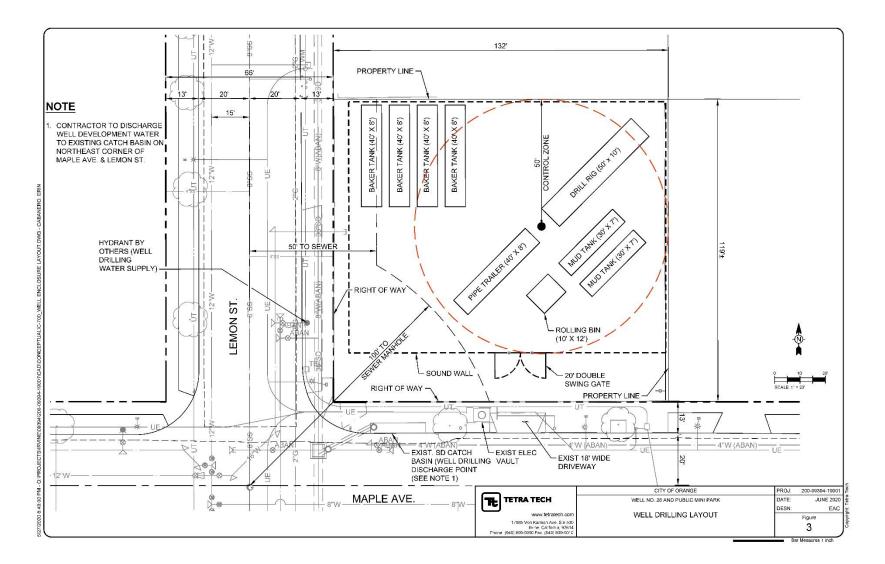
C: WELL CONSTRUCTION LAYOUT
